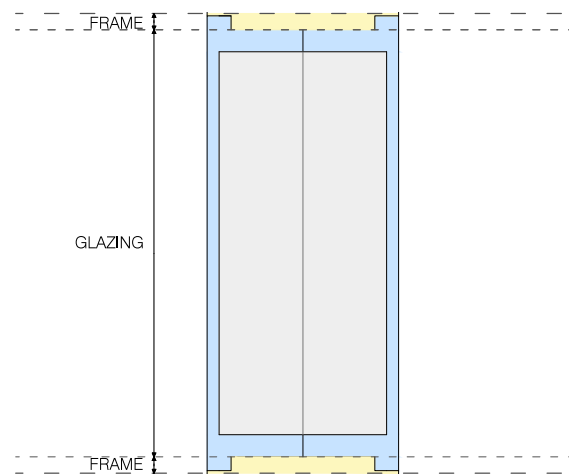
Simplified glass block cross section illustrating what is meant for frame and glazing
